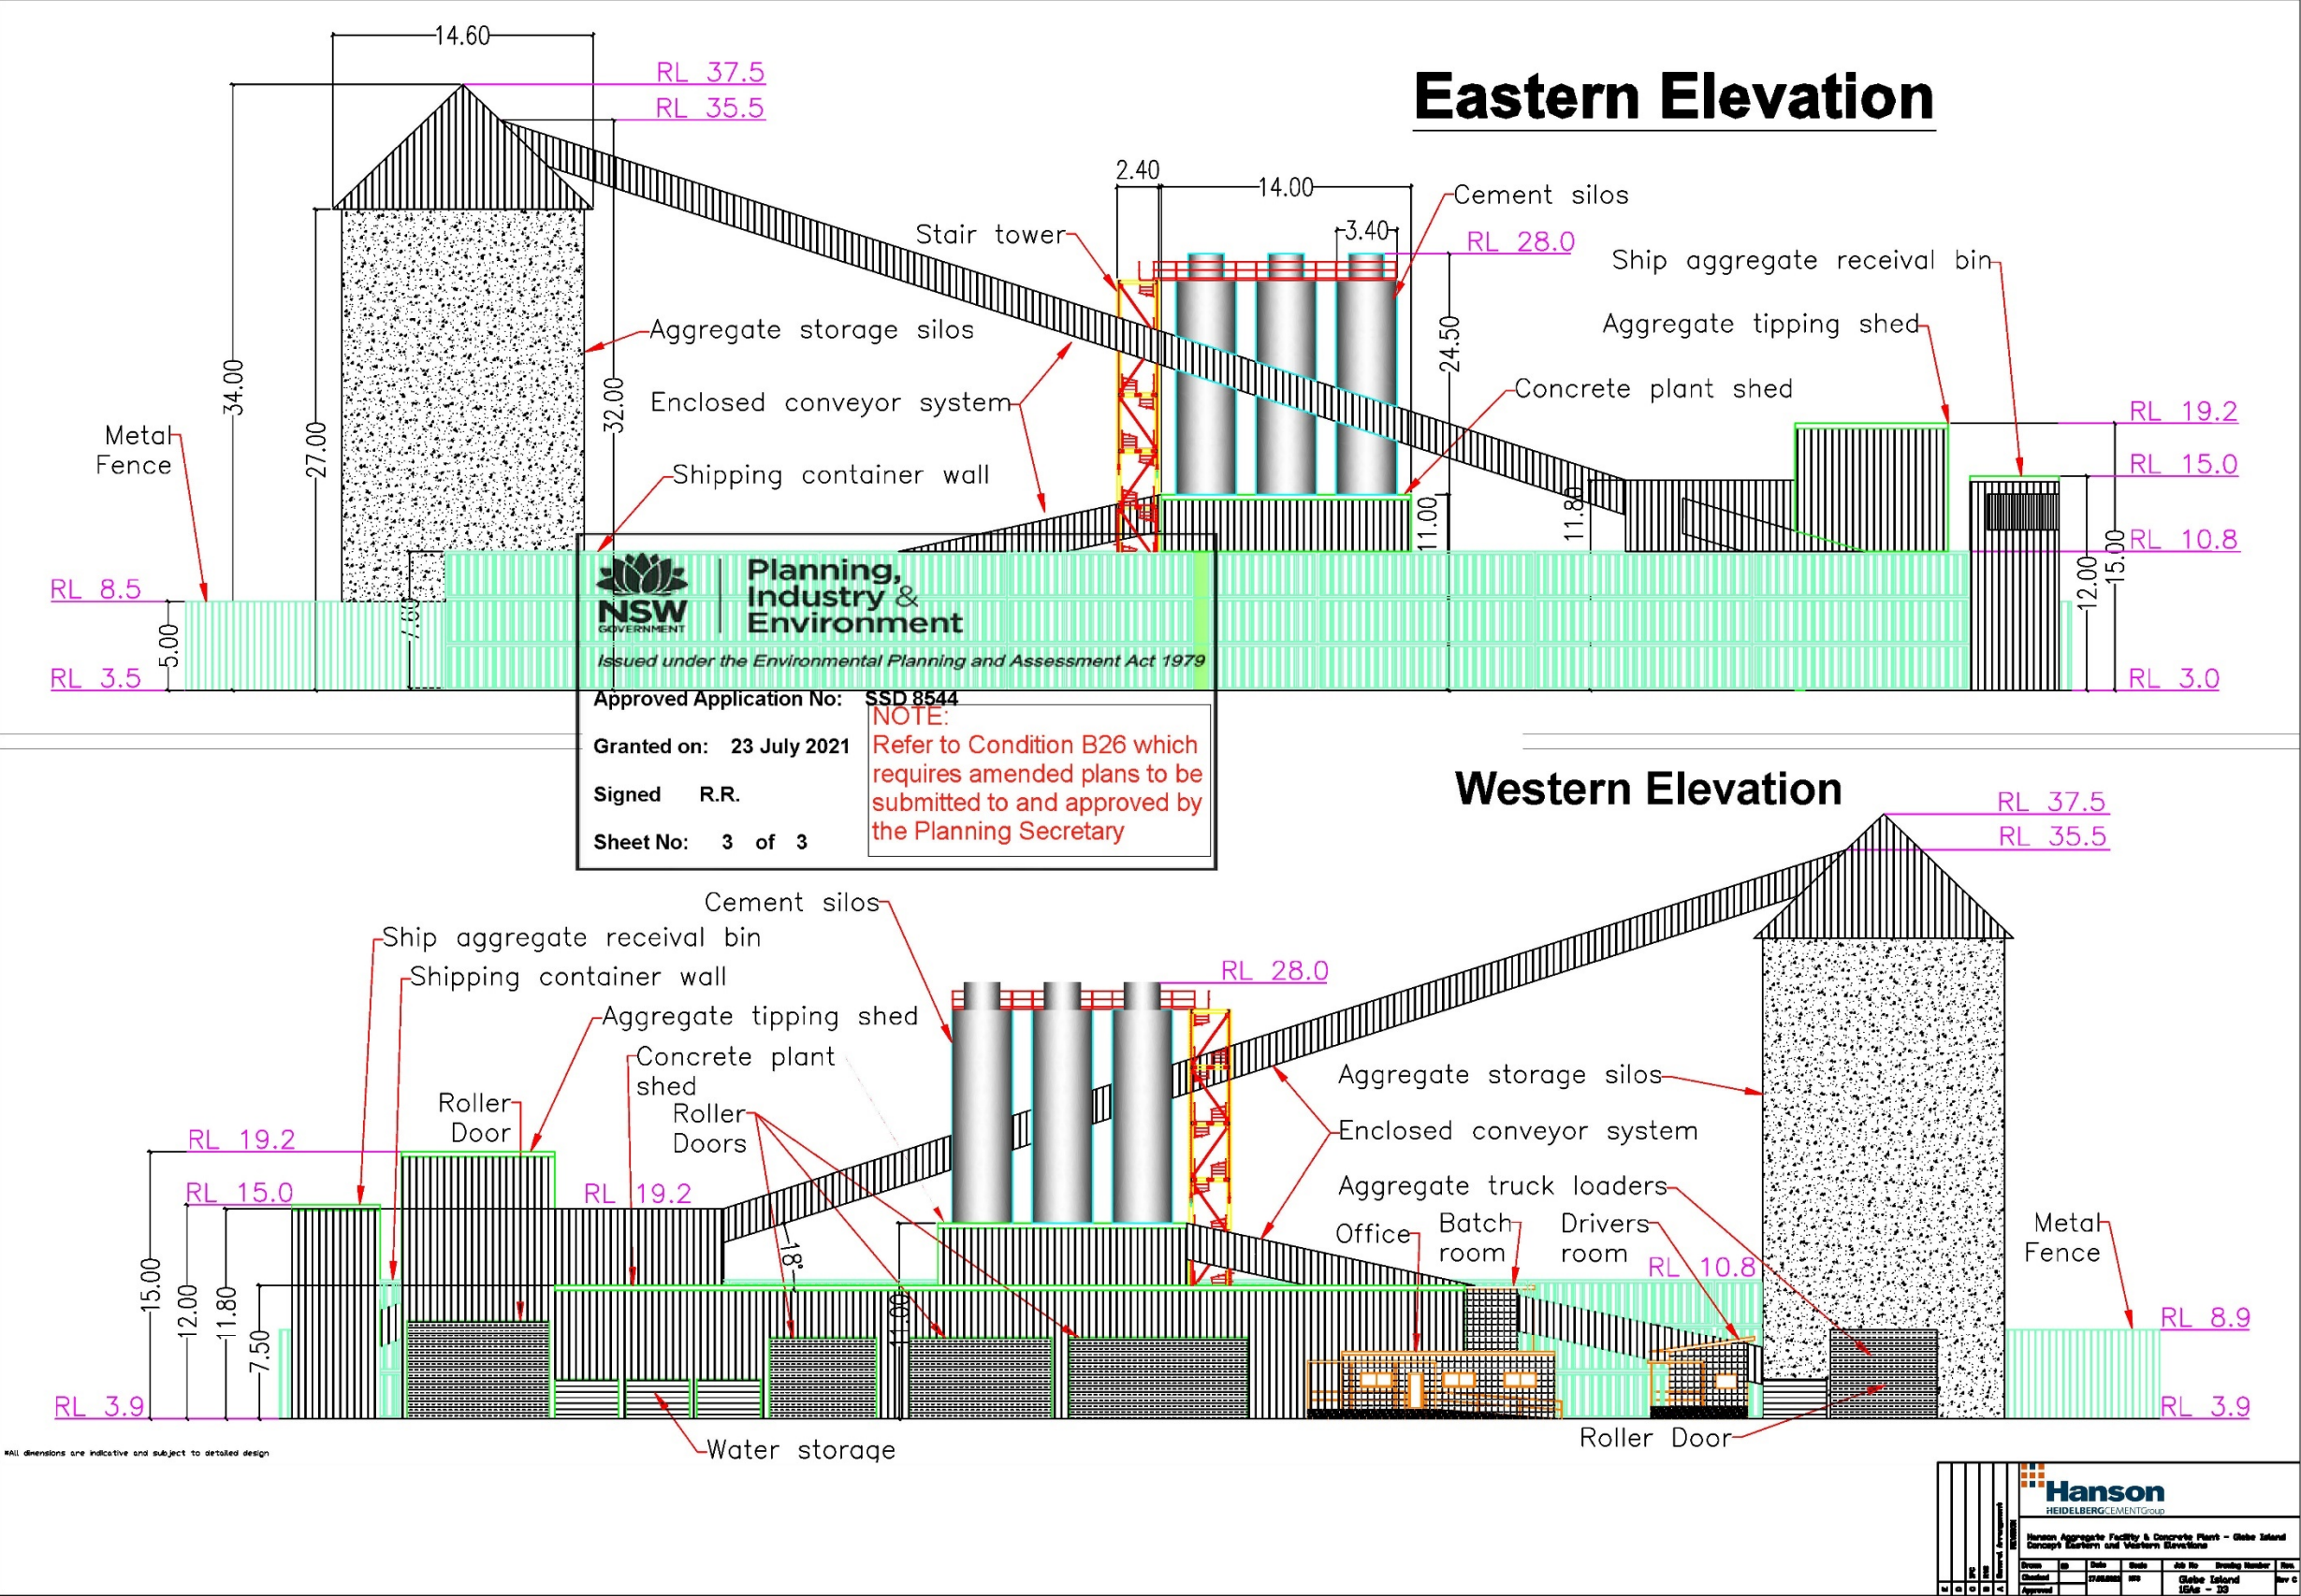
Stamped Approved Plan of the concept design showing the eastern and western elevations
